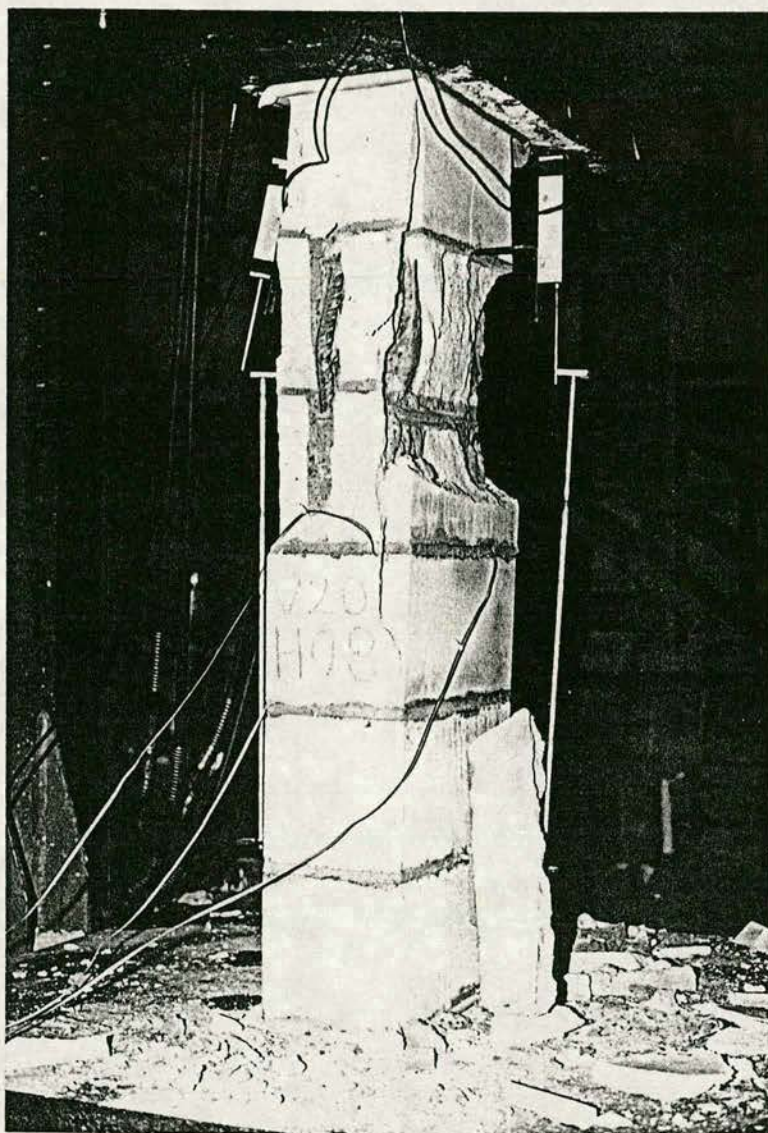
Typical mode of failure of full-block masonry columns reinforced with lateral ties and vertical bars.
